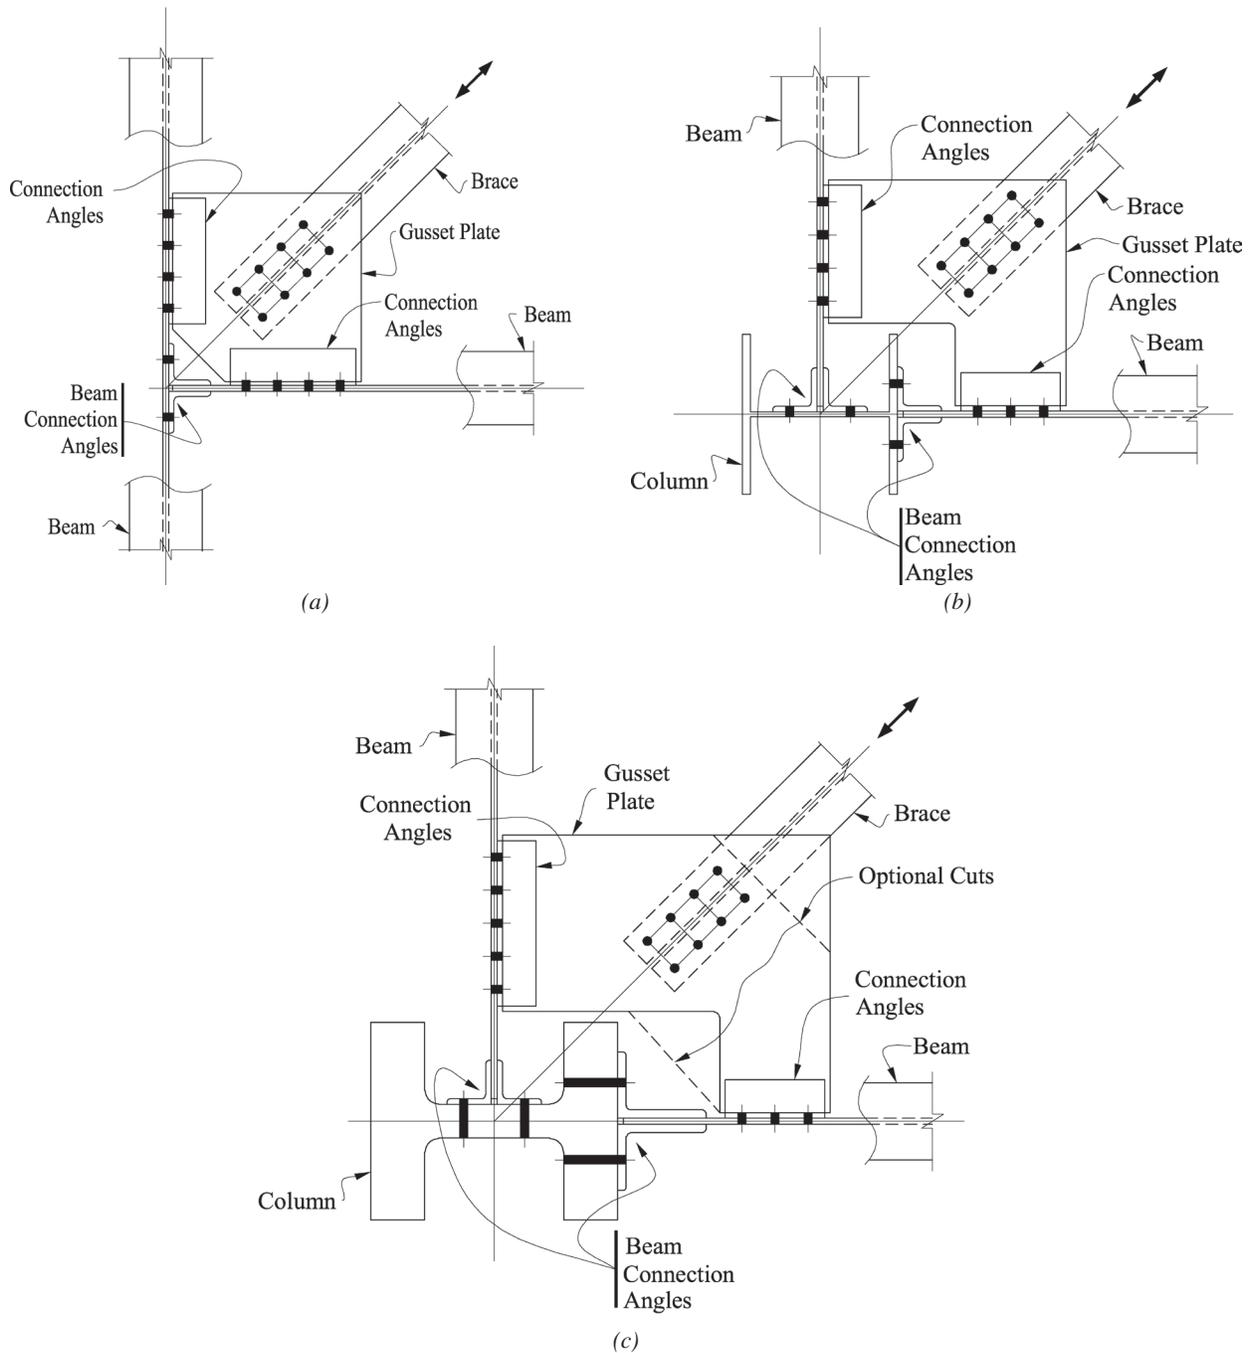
Horizontal brace gusset plates: (a) beam-to-beam interface; (b) beam-to-column interface with wrap-around gusset plate; (c) wrap-around gusset plate with a large cutout and optional diagonal cuts.
